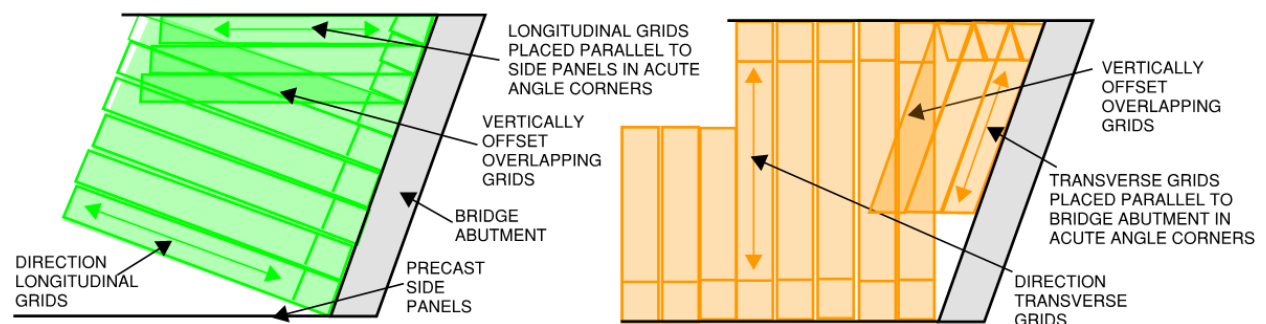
Arrangement of Longitudinal and Transverse Grid in Acute Angle Corners
